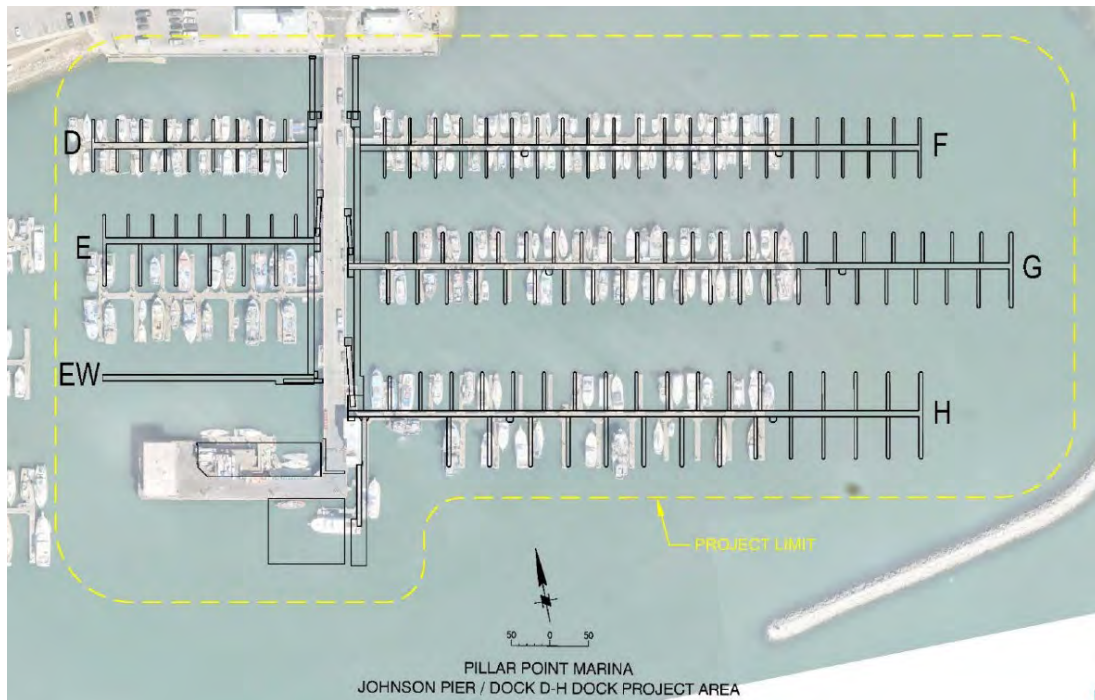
Johnson Pier Existing Features; Johnson Pier Expansion and Dock Replacement
